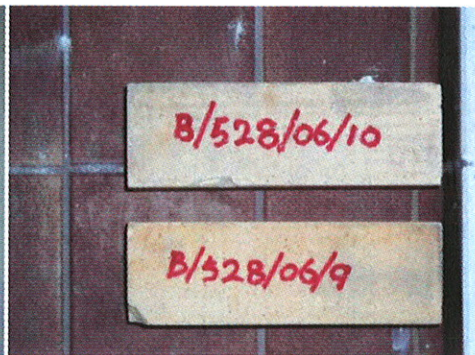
JM Insulating Firebricks - Yellow fire bricks - Cremators Room and Storage Room
